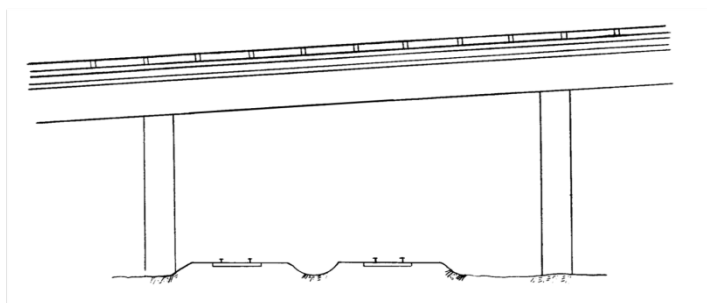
Bridge elevation view with two freight/passenger rail tracks below the bridge.
